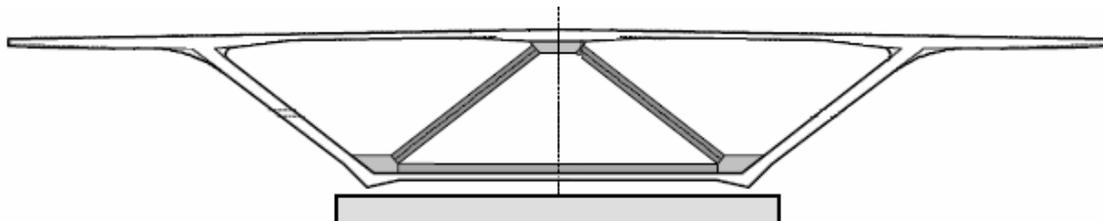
Sunshine Skyway Bridge (ID-11). Cross section of concrete sections for main span (Sayers, 2007).
